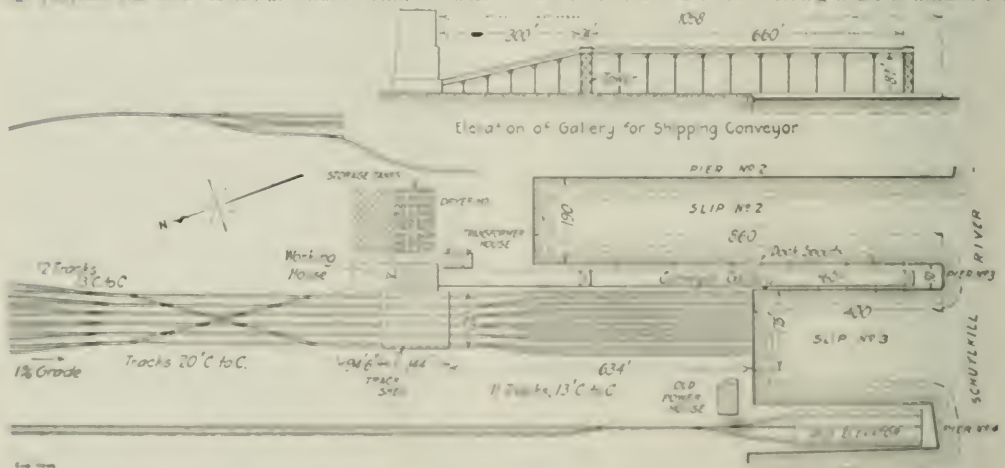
PLAN OF NEW GRAIN ELEVATOR AT GIRARD POINT, PHILADELPHIA, FOR THE PENNSYLVANIA R.R.
